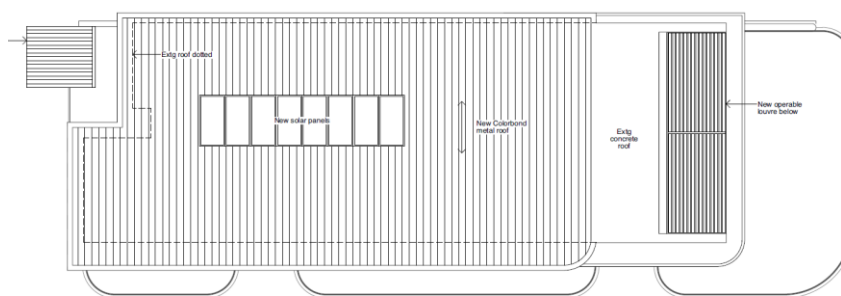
Proposed roof plan in PL/39/2021 – 10 Major Street, Coogee (Source: Ken Powell Architect)
